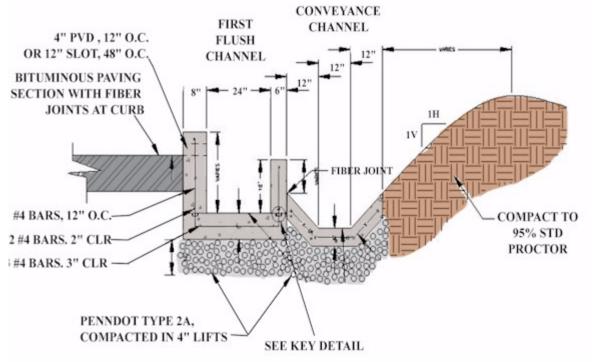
Shows the construction design detail for the perimeter channel section.
